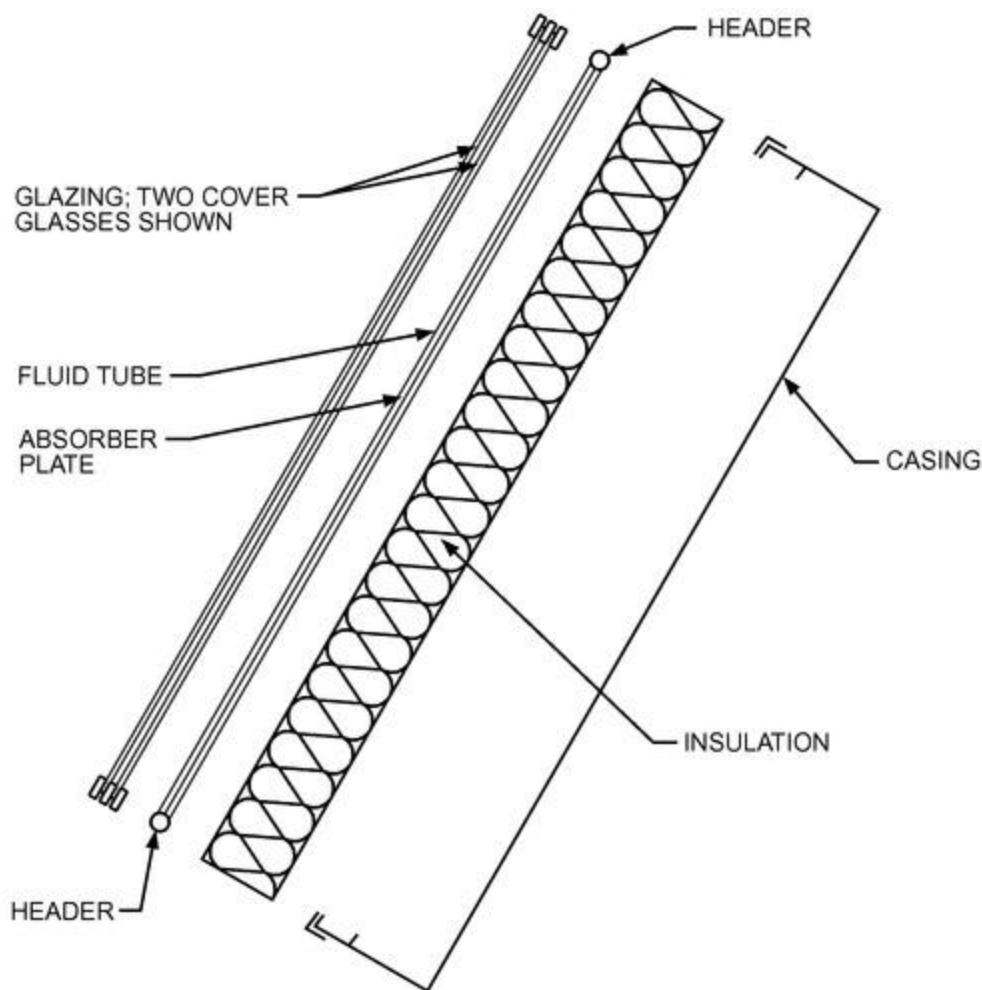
Exploded Cross Section Through Double-Glazed Solar Water Heater
